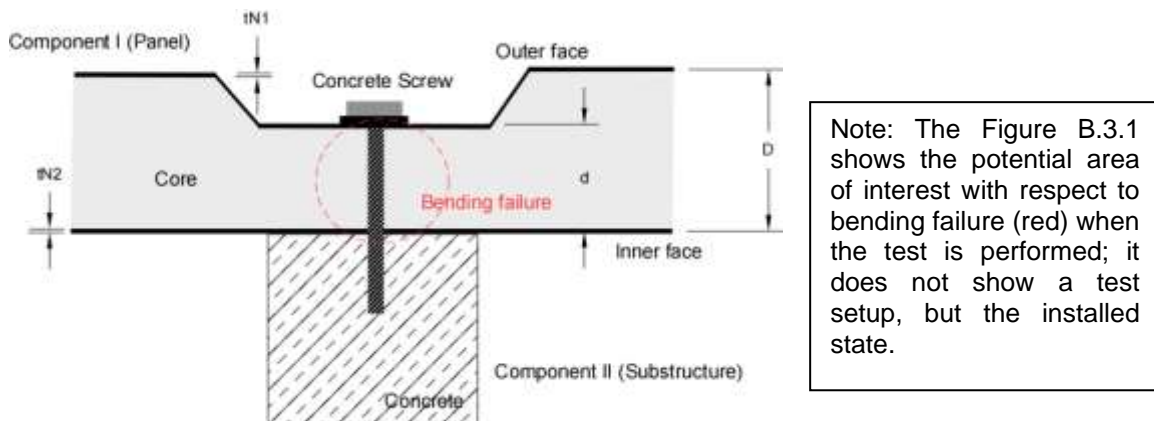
Principle illustration of the tested failure mechanism (red), shown in installed condition
